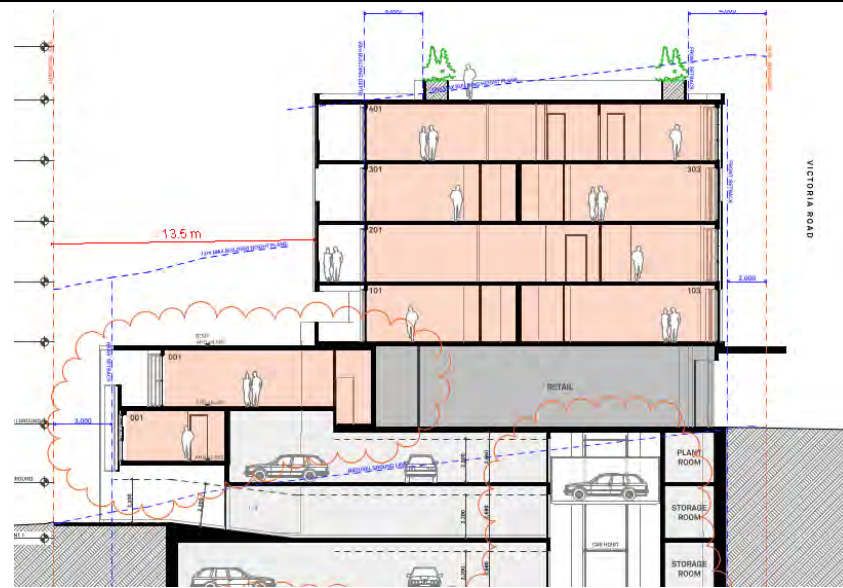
Section plan of site showing rear setbacks to Gerard Lane
